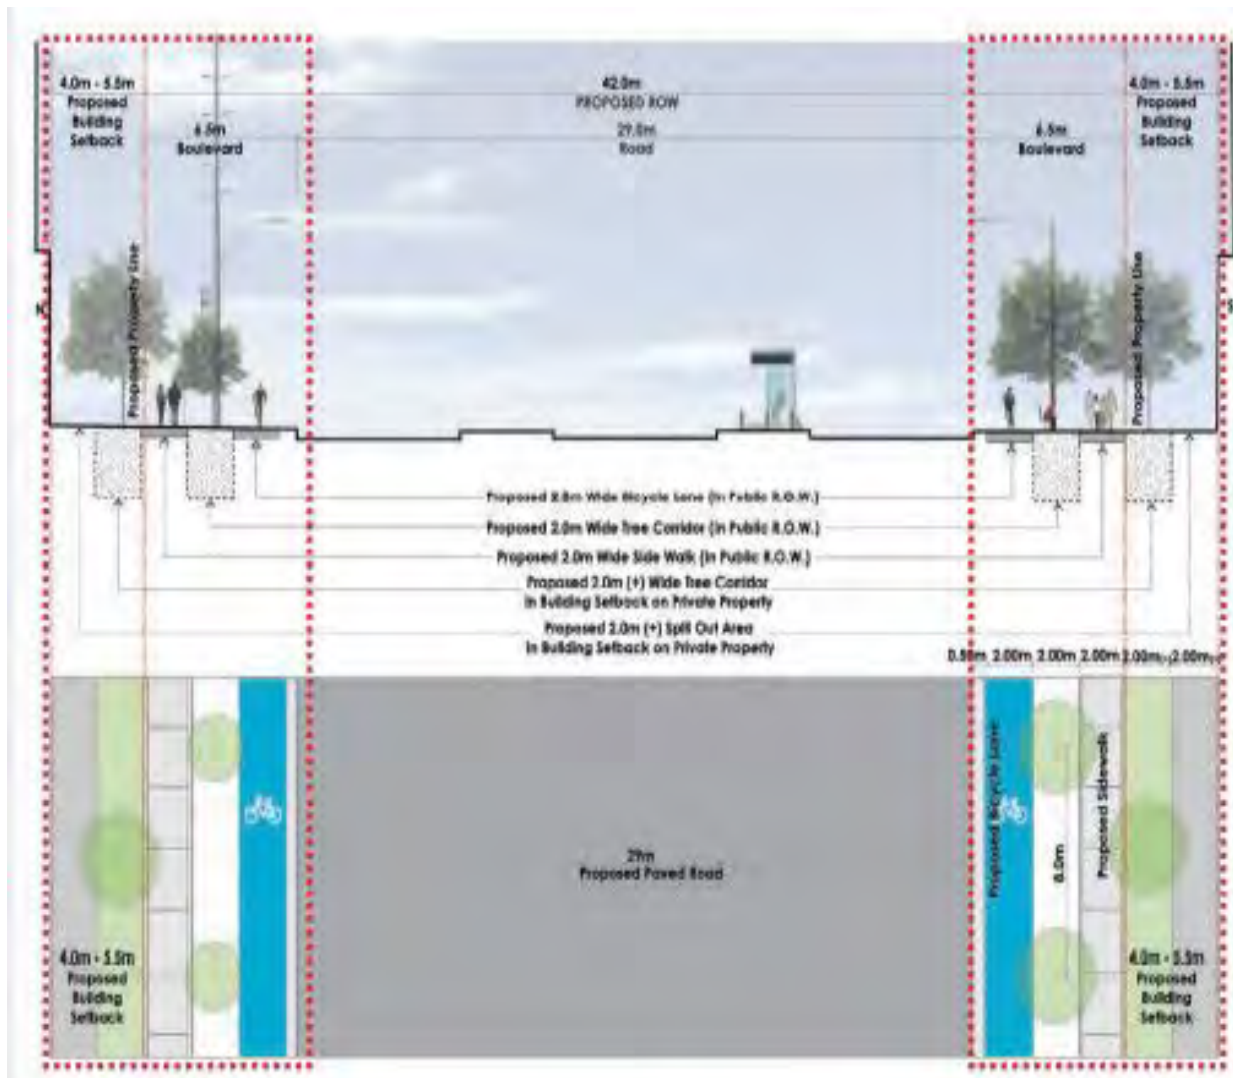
Dundas Connects Master Plan Figure 5-63 – Raised Cycle Track & Street Trees
